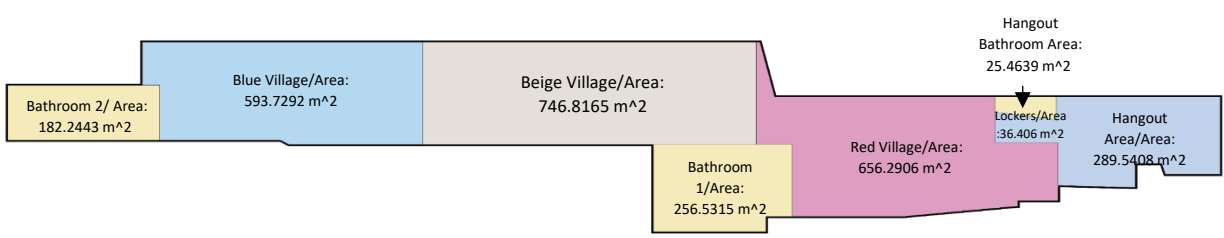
CityHub floor plan (out of scale) (source: CityHub Copenhagen website)
